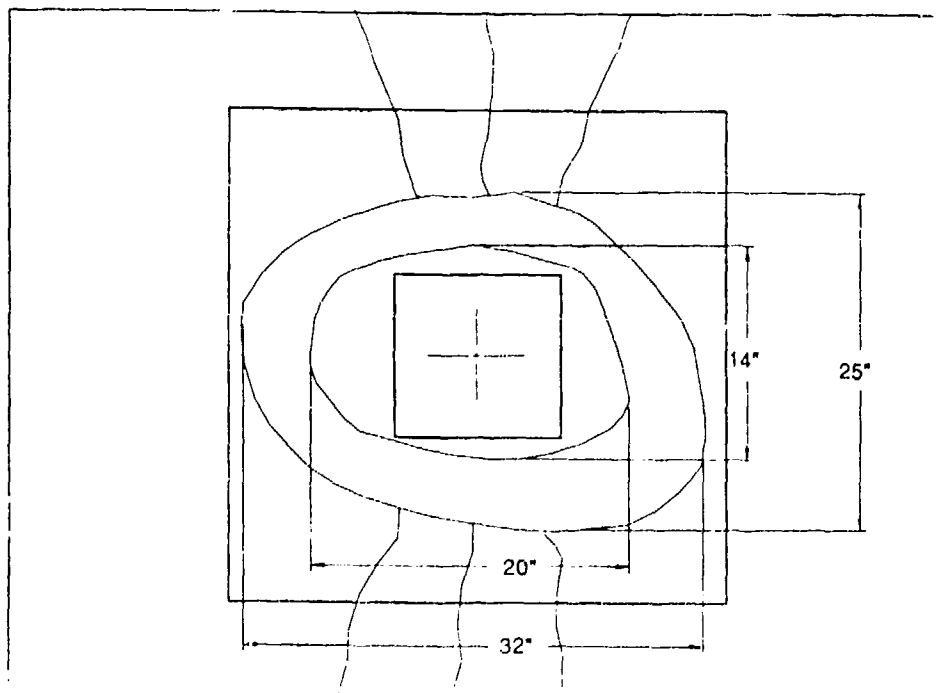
Test 9 Wall Damage (Type A, 2.7-Pound Cased Charge).
